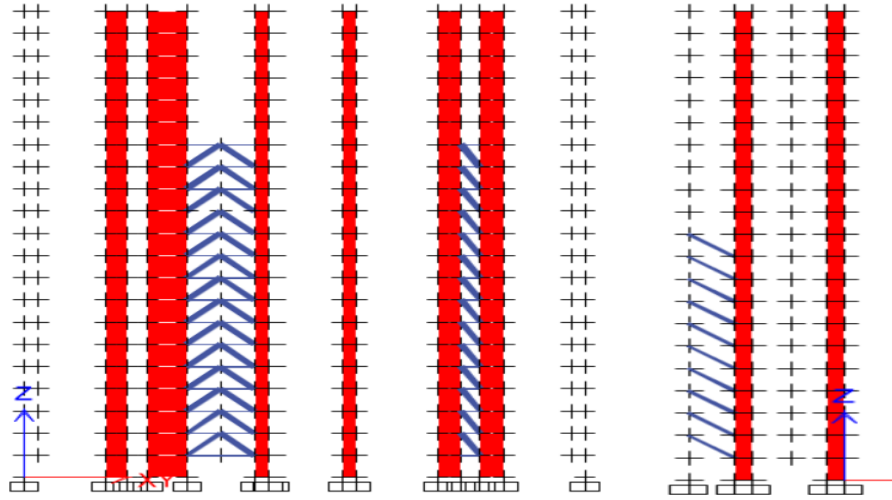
Elevation of steel braces X-2 and Y-2 on ETABS 2021
